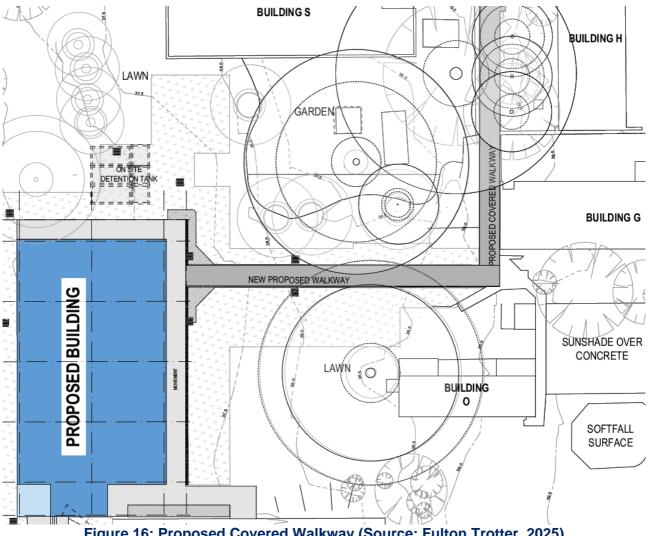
Proposed Covered Walkway (Source: Fulton Trotter, 2025)
